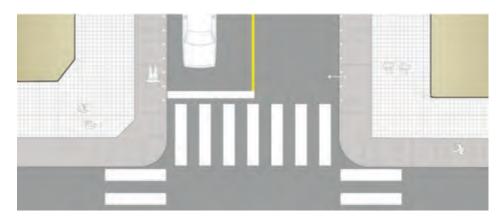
Plan of the Existing Conditions of Broadway Avenue intersection with Yonge Street
